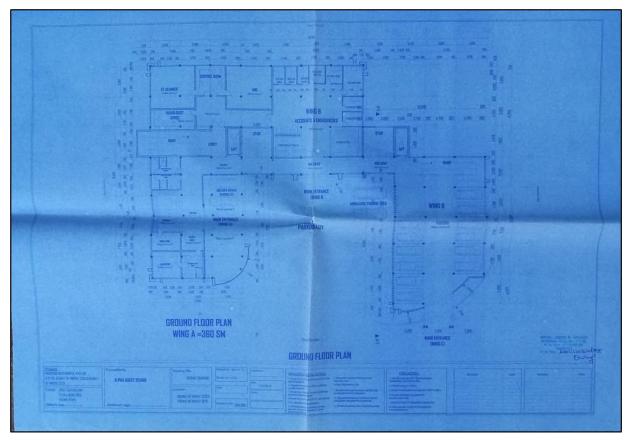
Copy of architectural plan of space allocation in ground floor of the main building.
